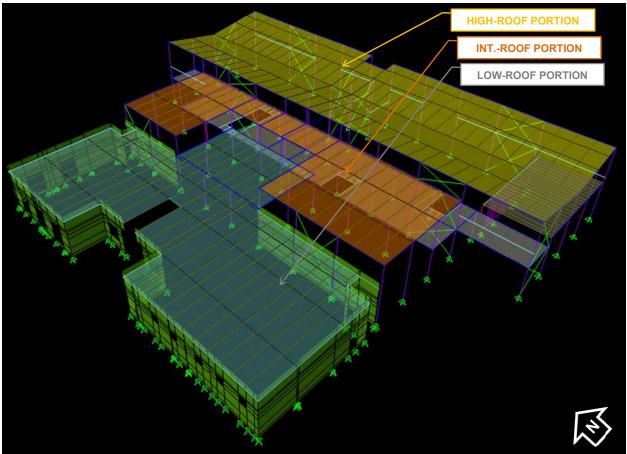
Maintenance Center Analysis Model of Existing Building
